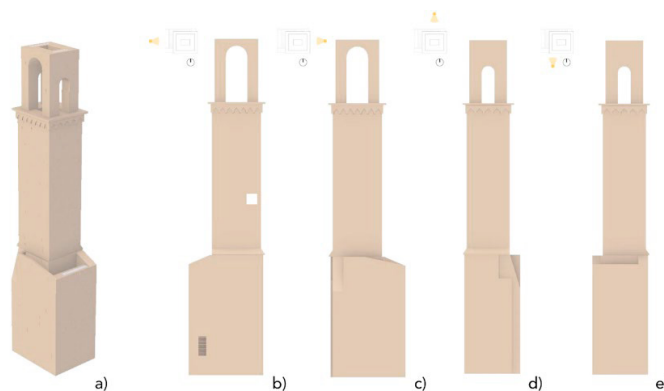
Civic Tower of Amatrice: (a) Axonometric view, (b) east façade, (c) west façade, (d) north façade, and (e) south façade
